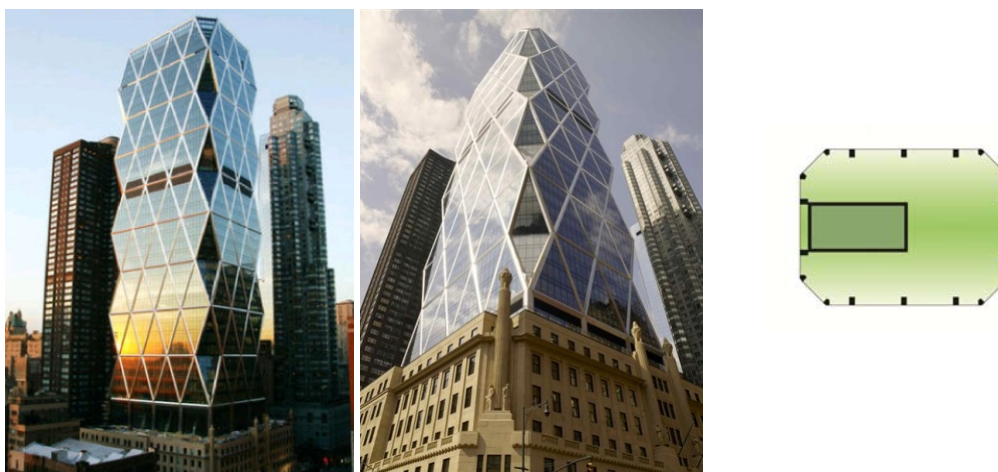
Hearst Tower, New York, USA (source: Foster and Partners) and its floor plan
